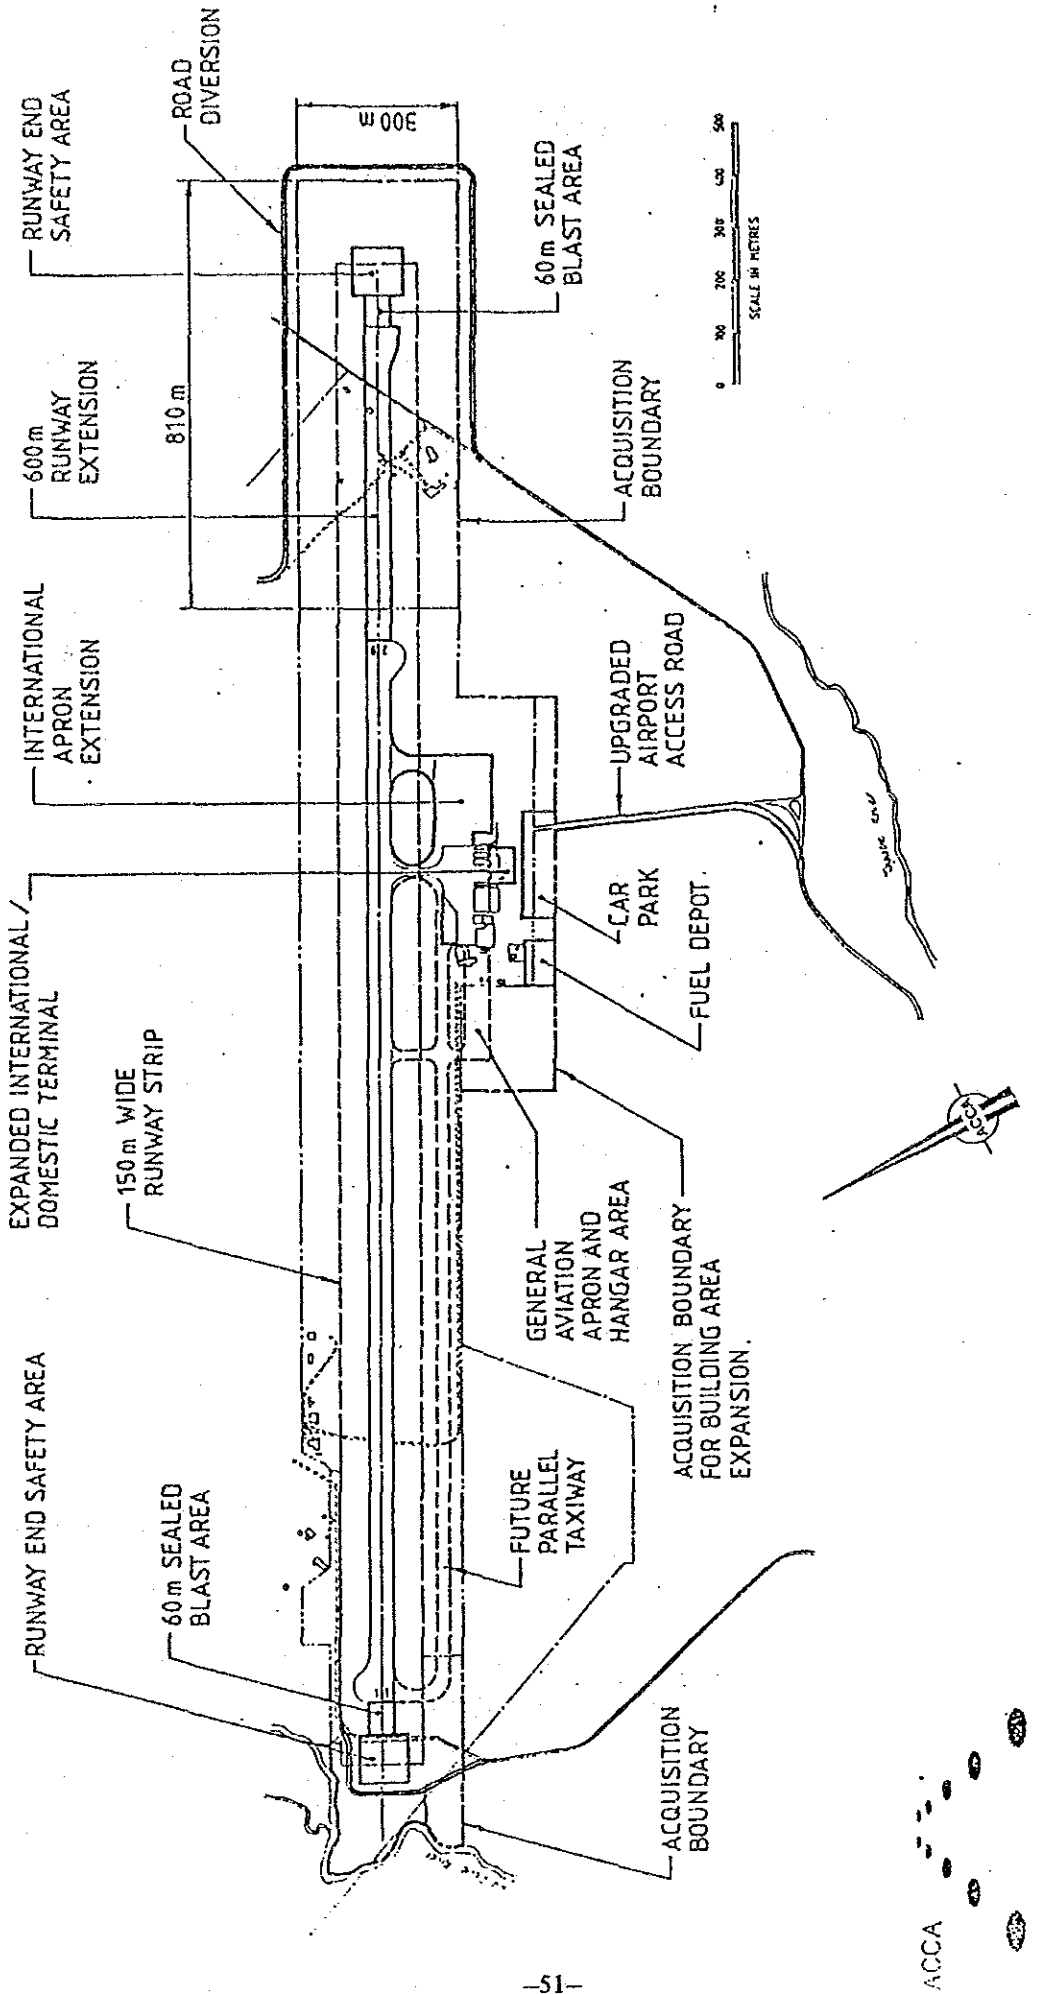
Development Master Plan of Bauerfield International Airport
